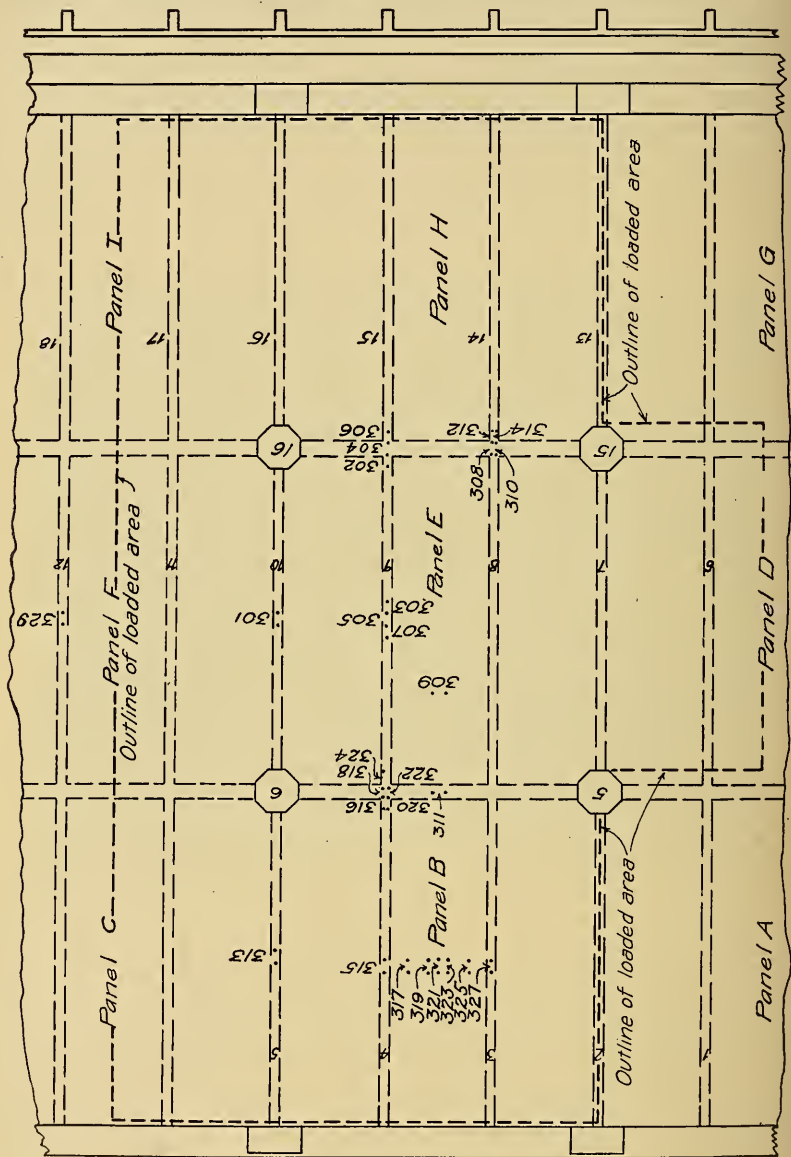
PLAN SHOWING LOCATION OF GAUGE LINES ON UPPER SIDE OF FLOOR.
